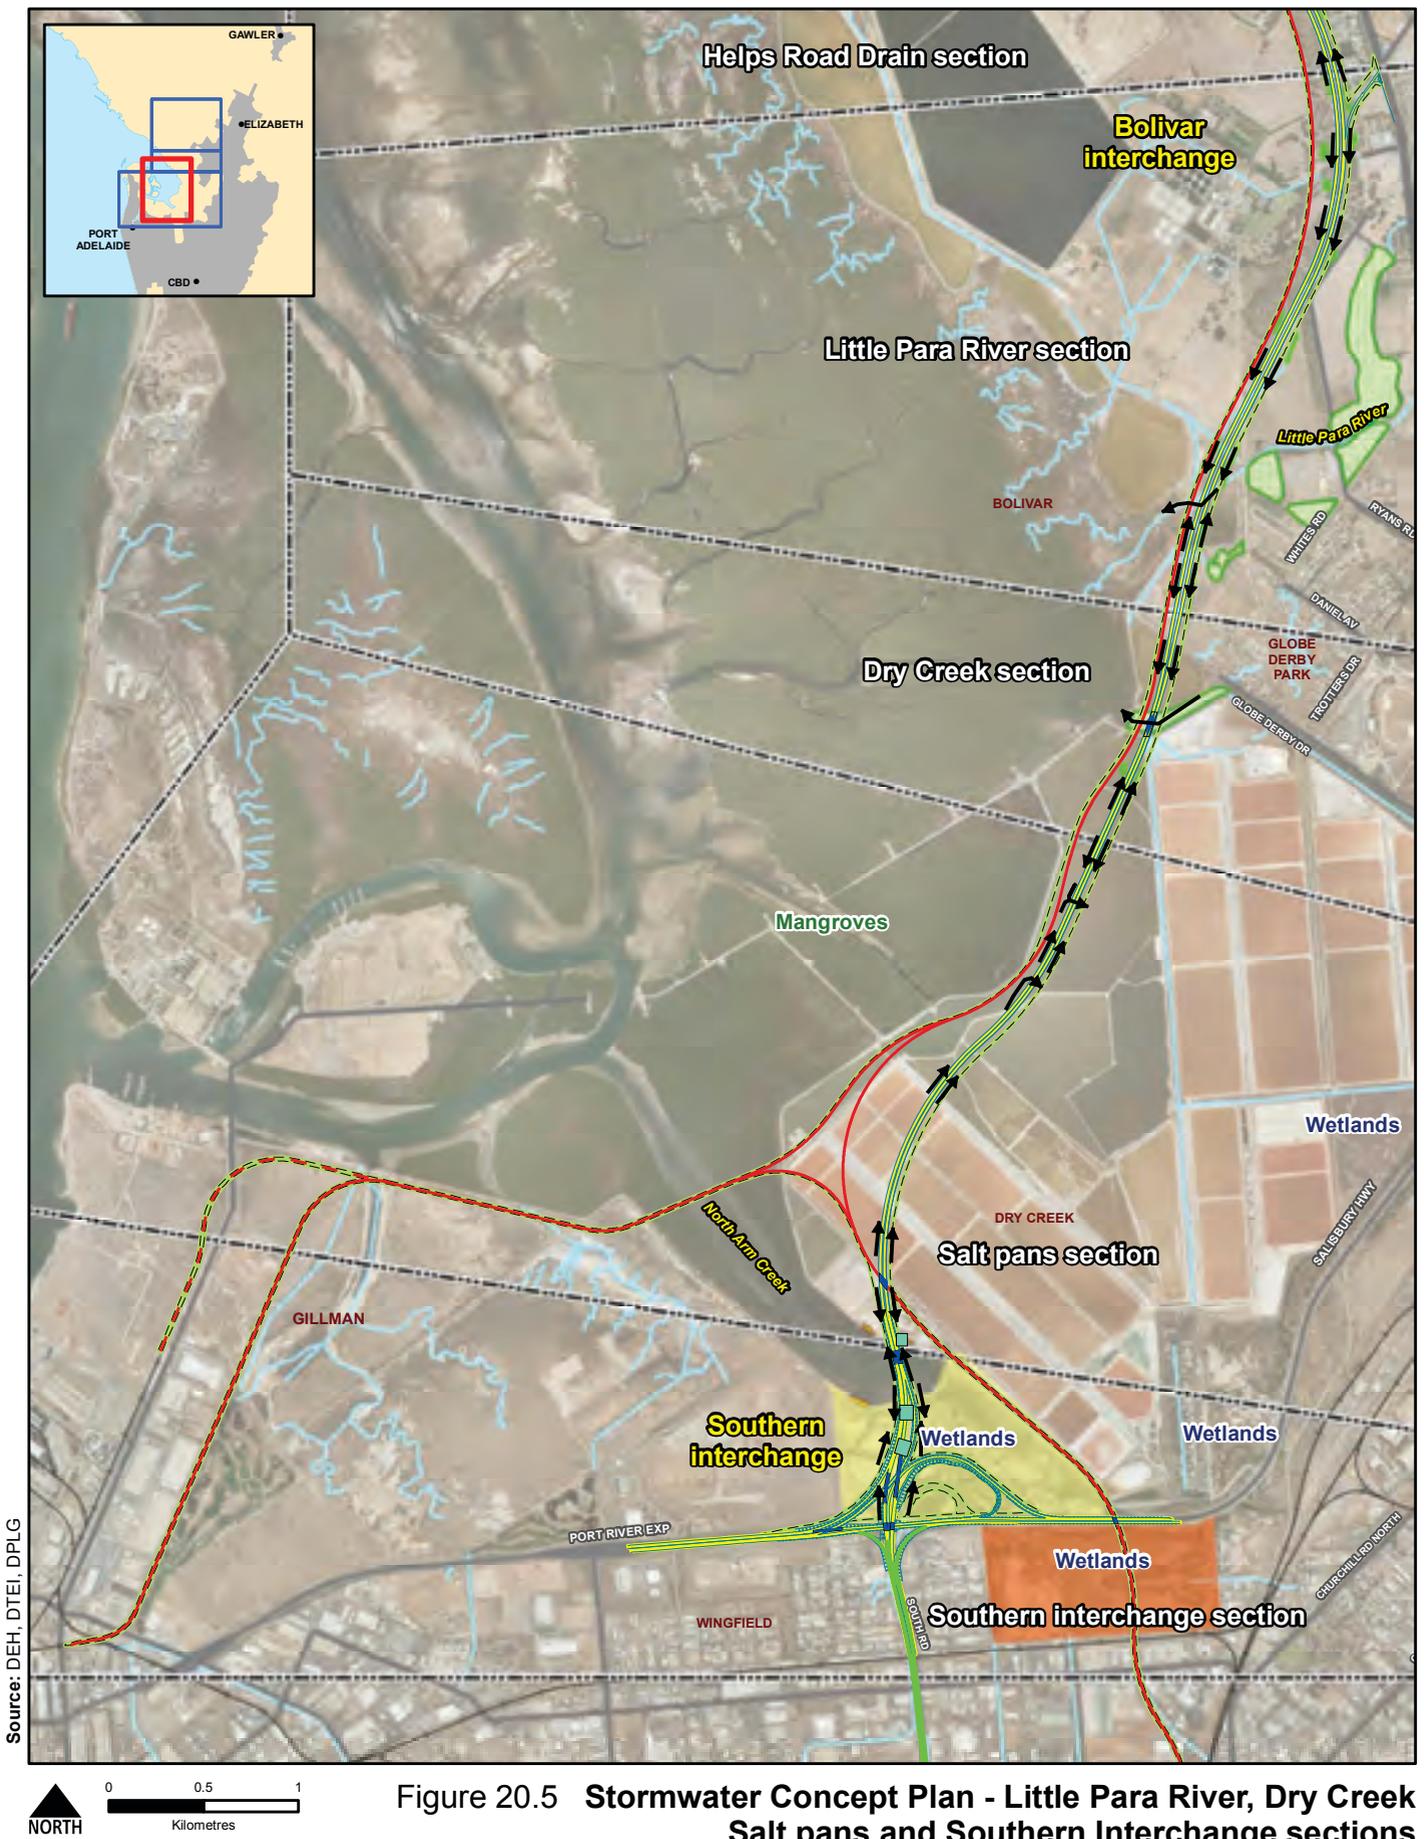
Stormwater Concept Plan - Little Para River, Dry Creek Salt pans and Southern Interchange sections
